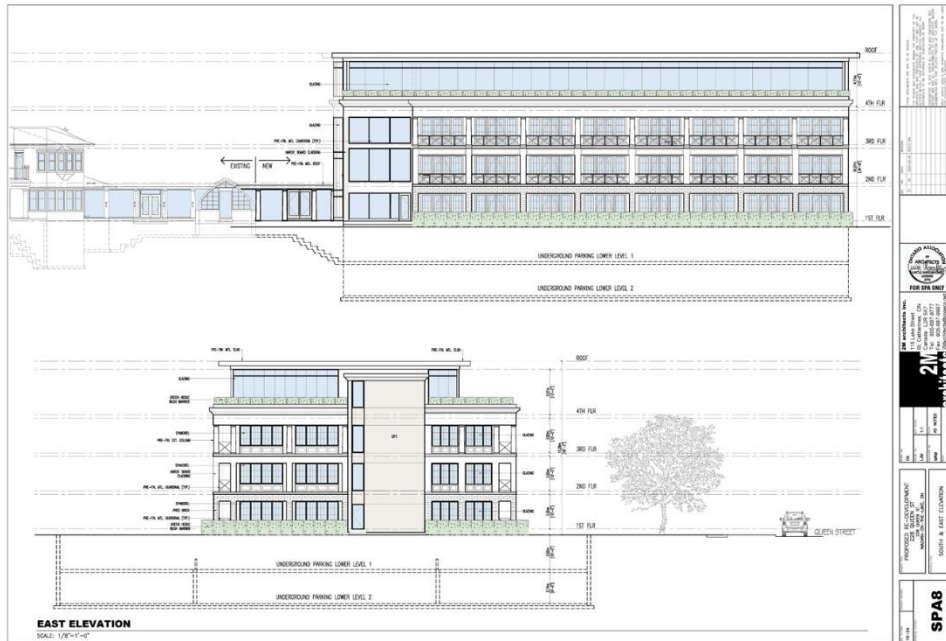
North Elevation of New Building from Johnson Street Direction and East Elevation from Simcoe Street at Queen Street, 2M Architects (APPENDIX II)
